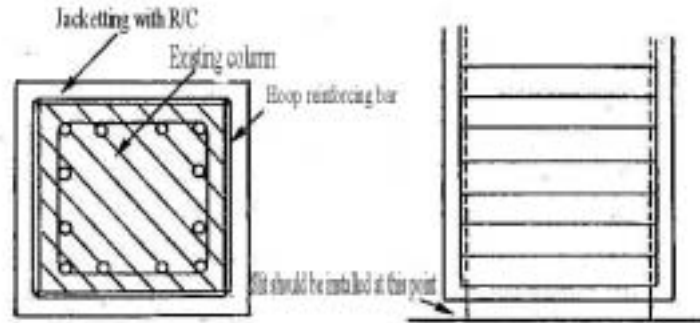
Schematic Drawing of Slit that is Made at the Column End
